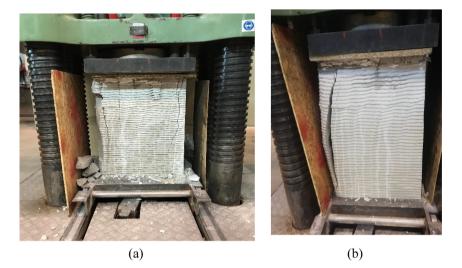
Failure mechanism in case of (a) structural wall and (b) insulated wall type
